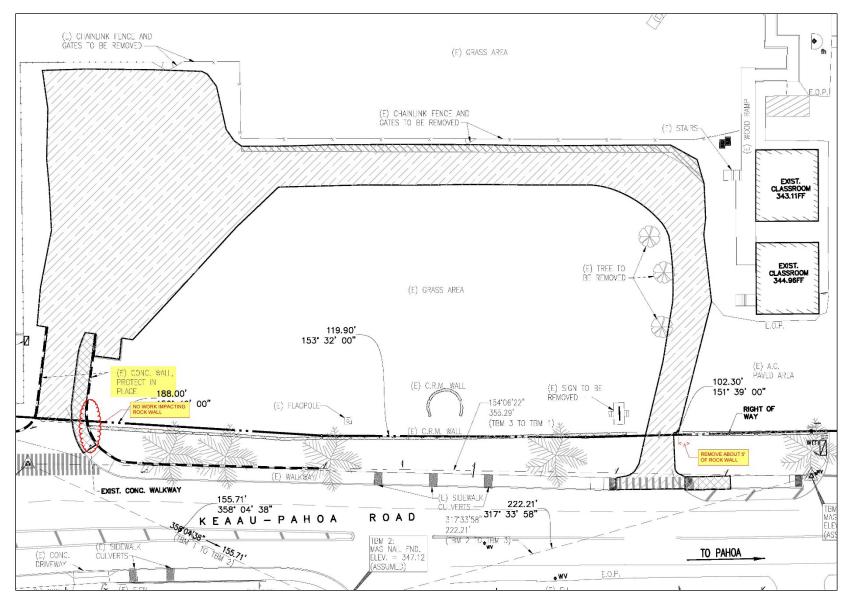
Detail portion of civil engineering plans showing plans to remove ~5-foot section of the rock wall (Honua 2) (lower right)
